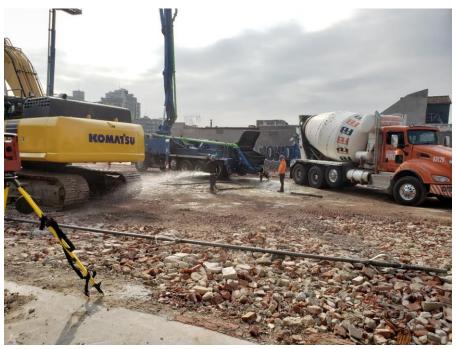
Kingdom spraying water to control dust in the work area (facing west)
